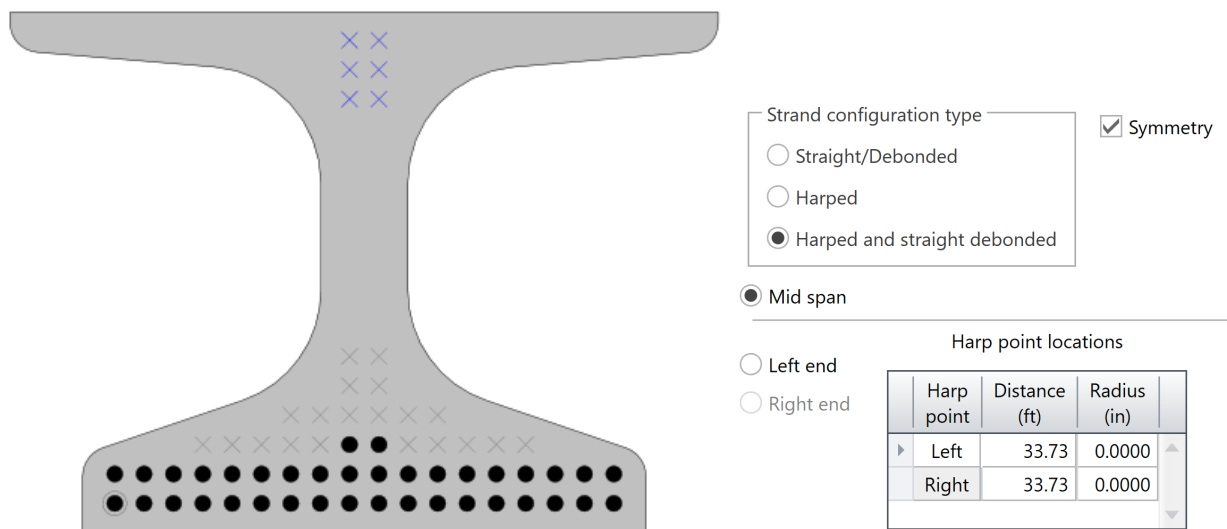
Bridge Girder Details for S080 41465 (AASHTOWare™ BrR, 2023)
